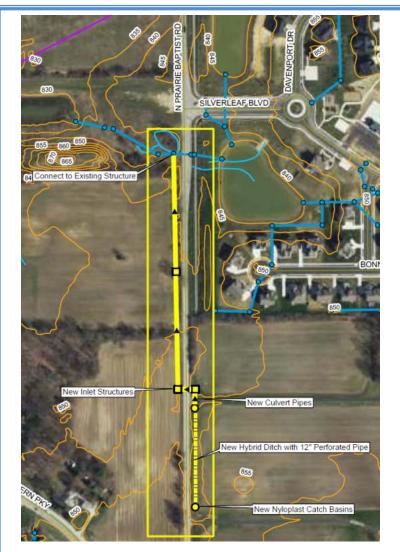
Prairie Baptist South of Silverleaf Blvd. Drainage Improvements
